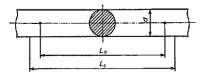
Geometry of specimen steel rebar based on SNI 2052:2017 standard.
